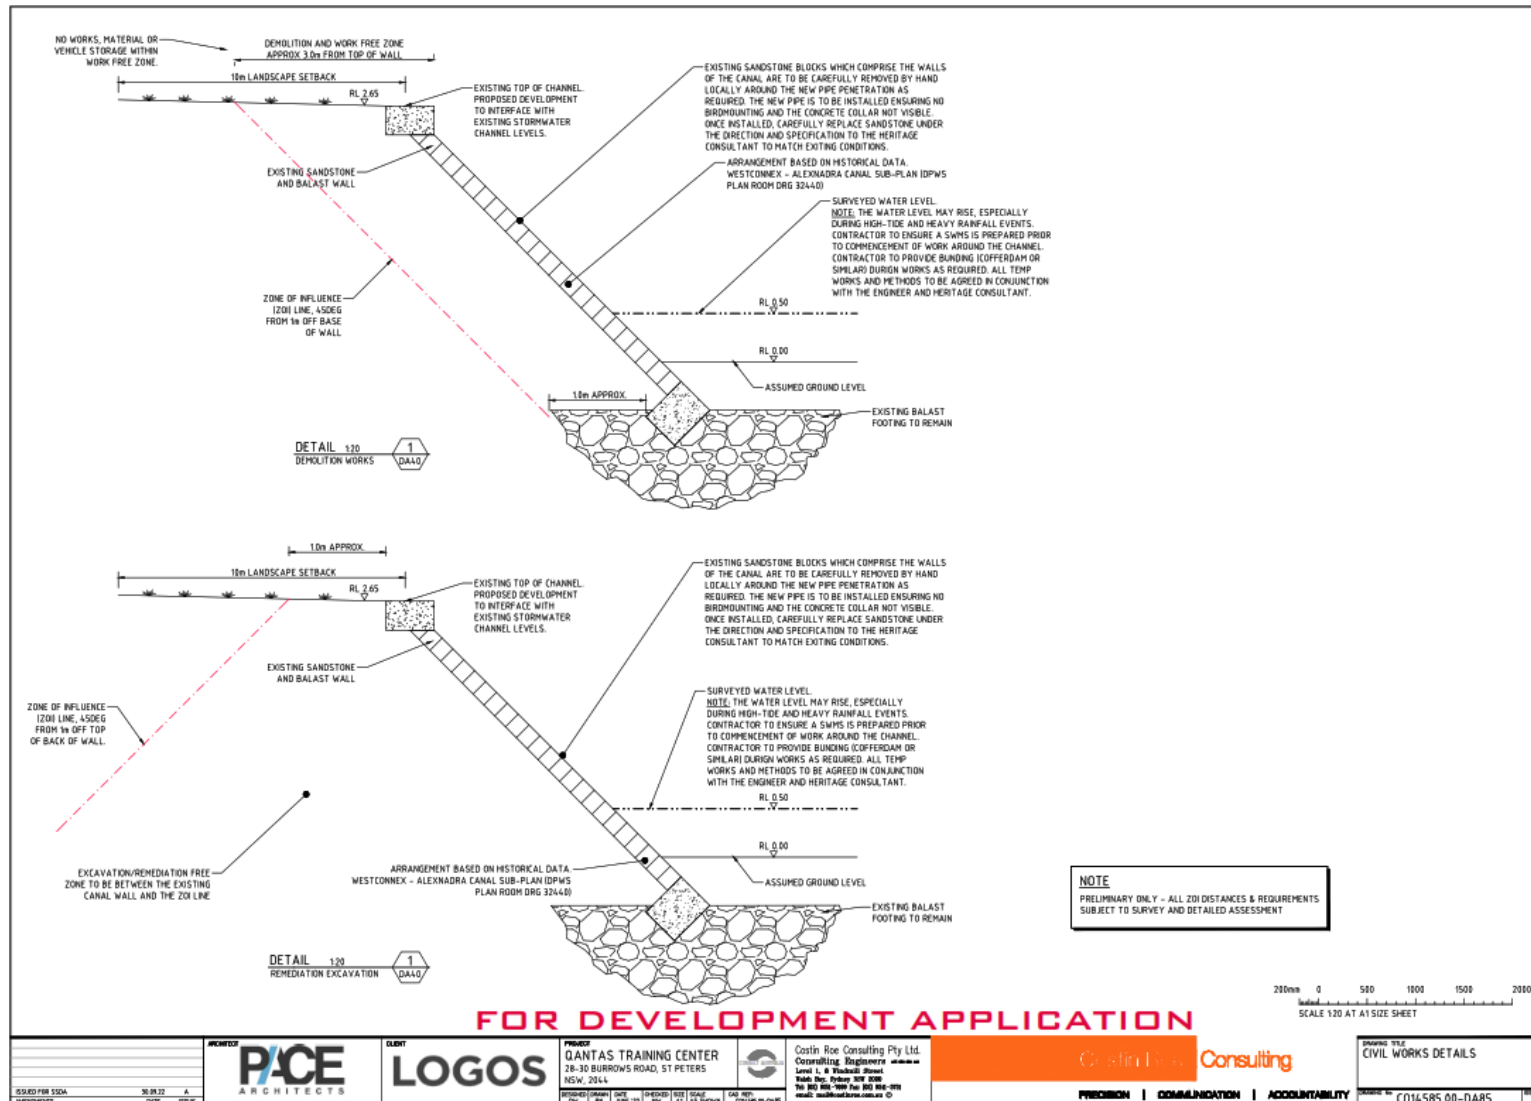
Section of Alexandra Canal Wall Civil Works Details (Source: LOGOS, 2022)
